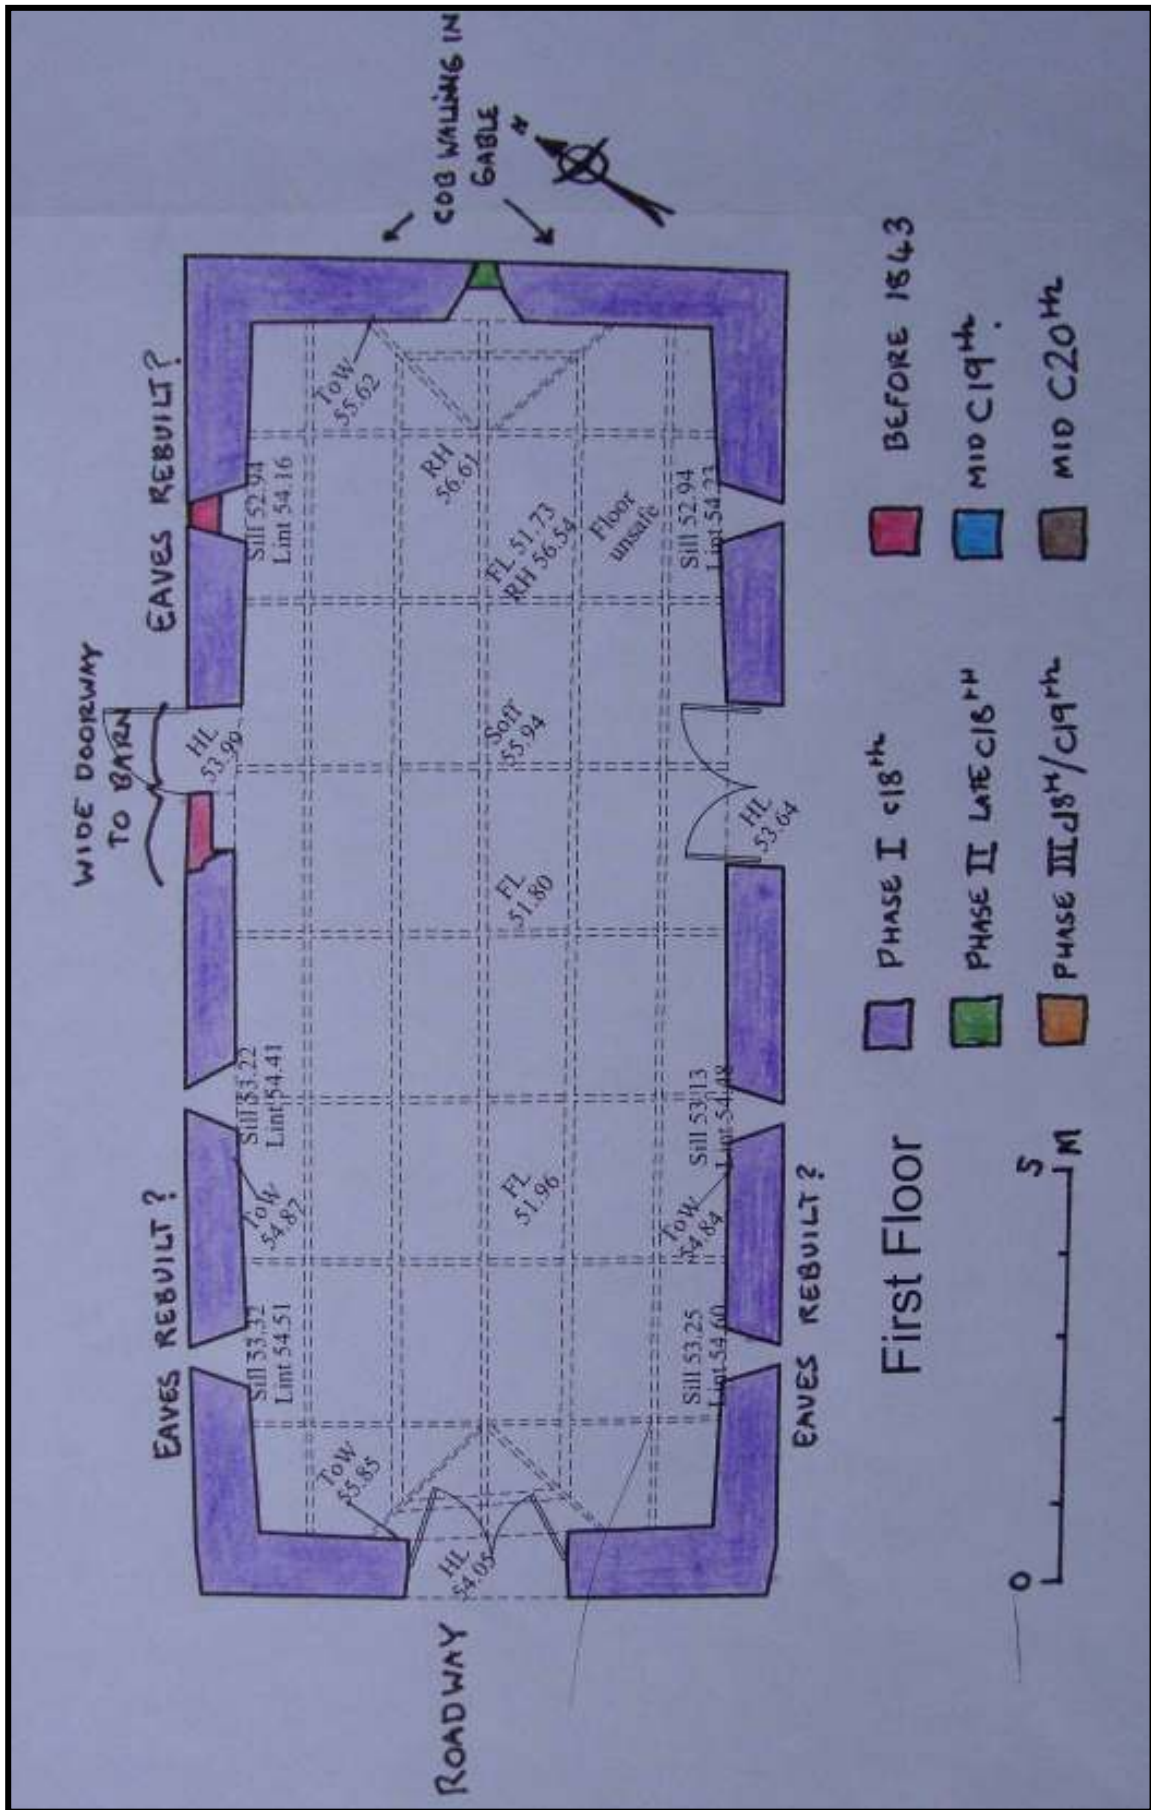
Plan at first-floor level showing suggested phasing. Based on drawings by DMR Design
